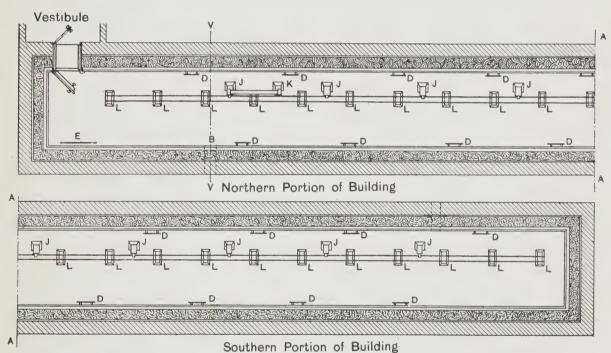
Sectional Plan of 32^m Base Showing location of 32^m base, track, etc.
